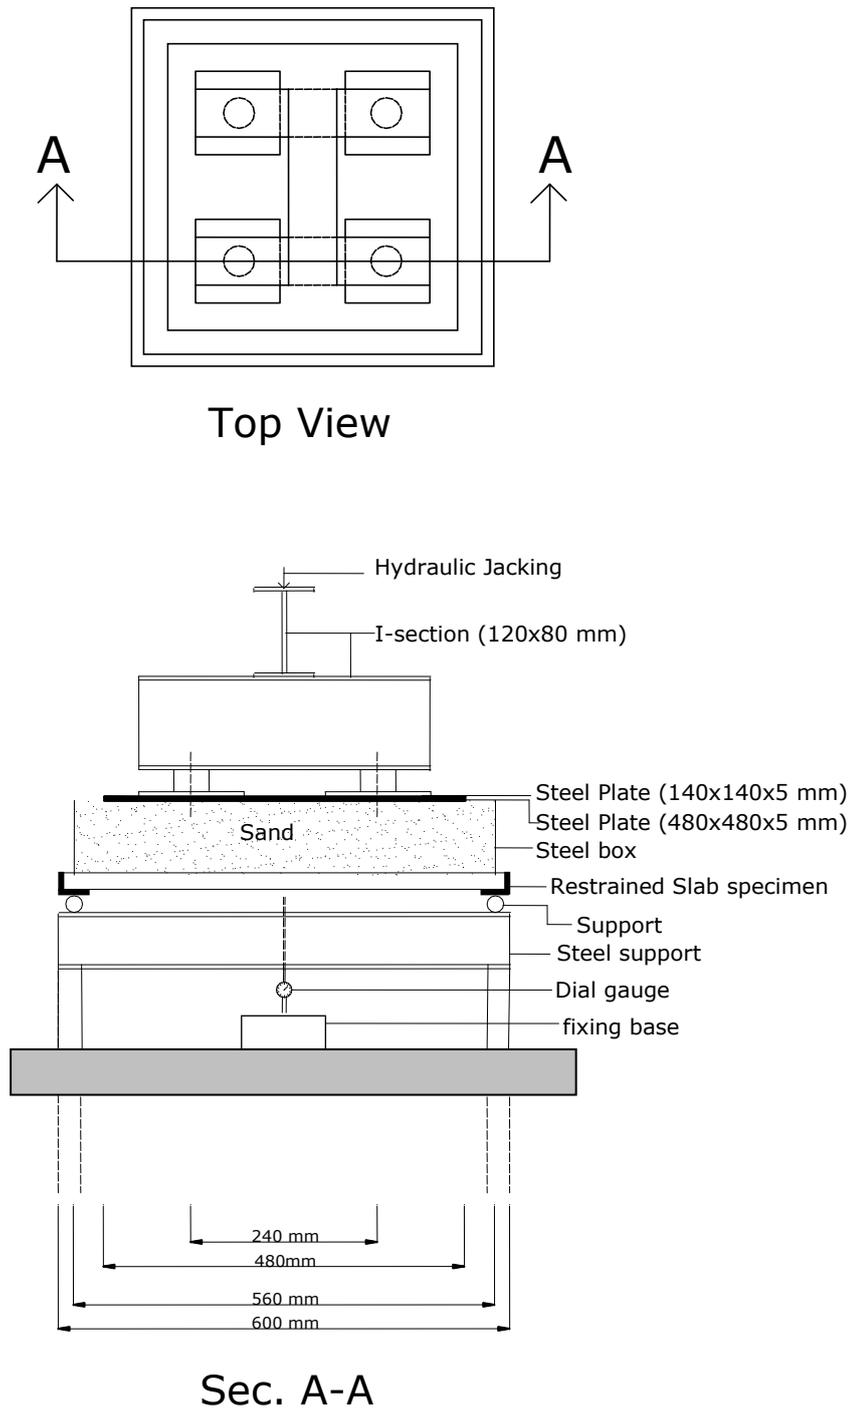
Loading arrangement and test setup for uniform load flexure test.
